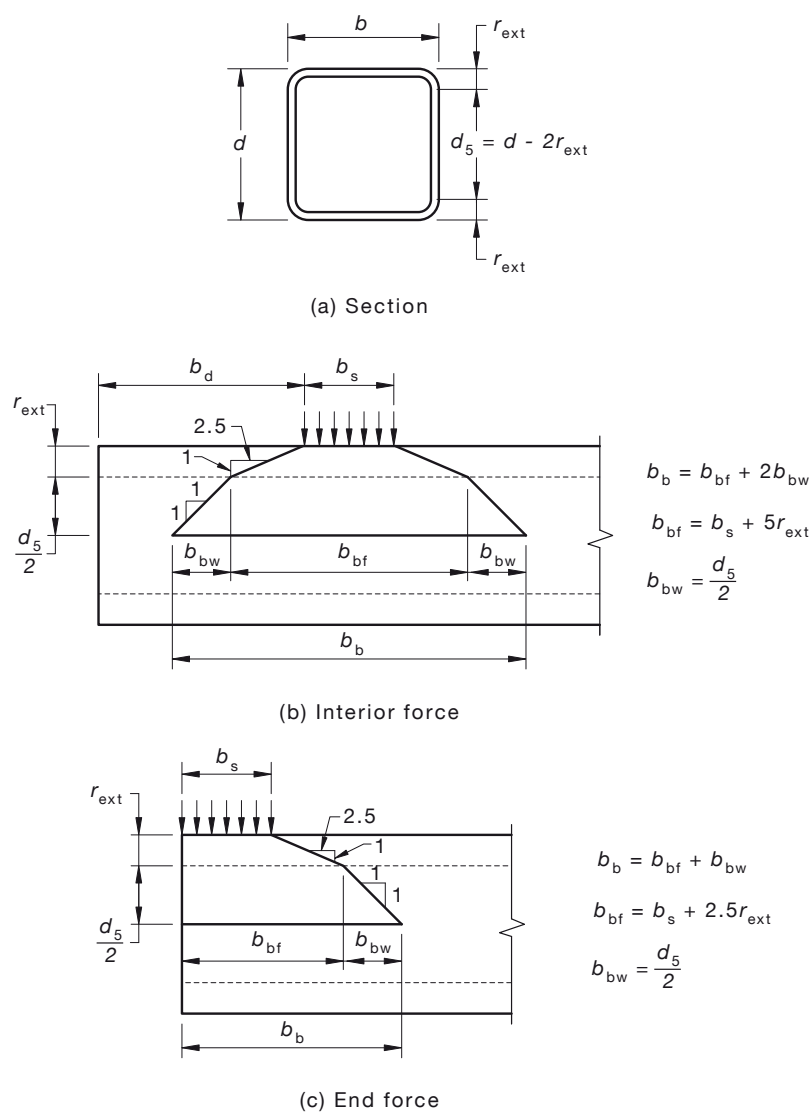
RECTANGULAR AND SQUARE HOLLOW SECTIONS—DISPERSION OF FORCE THROUGH FLANGE, RADIUS AND WEB
